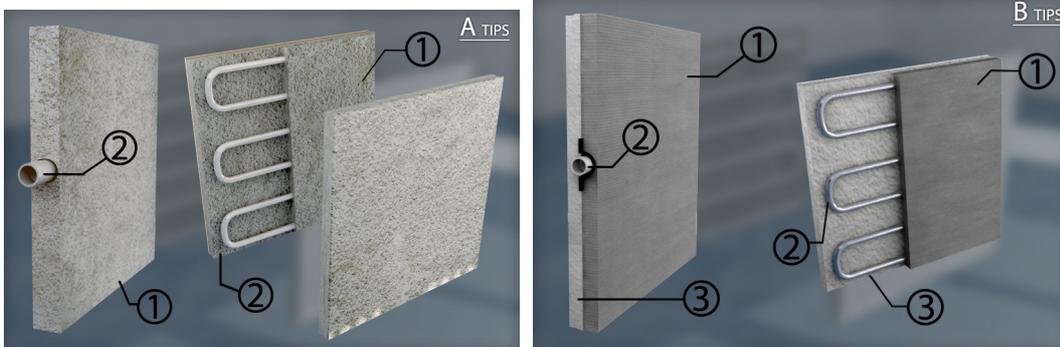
A-type system: pipes built into the dispersing paving or concrete
